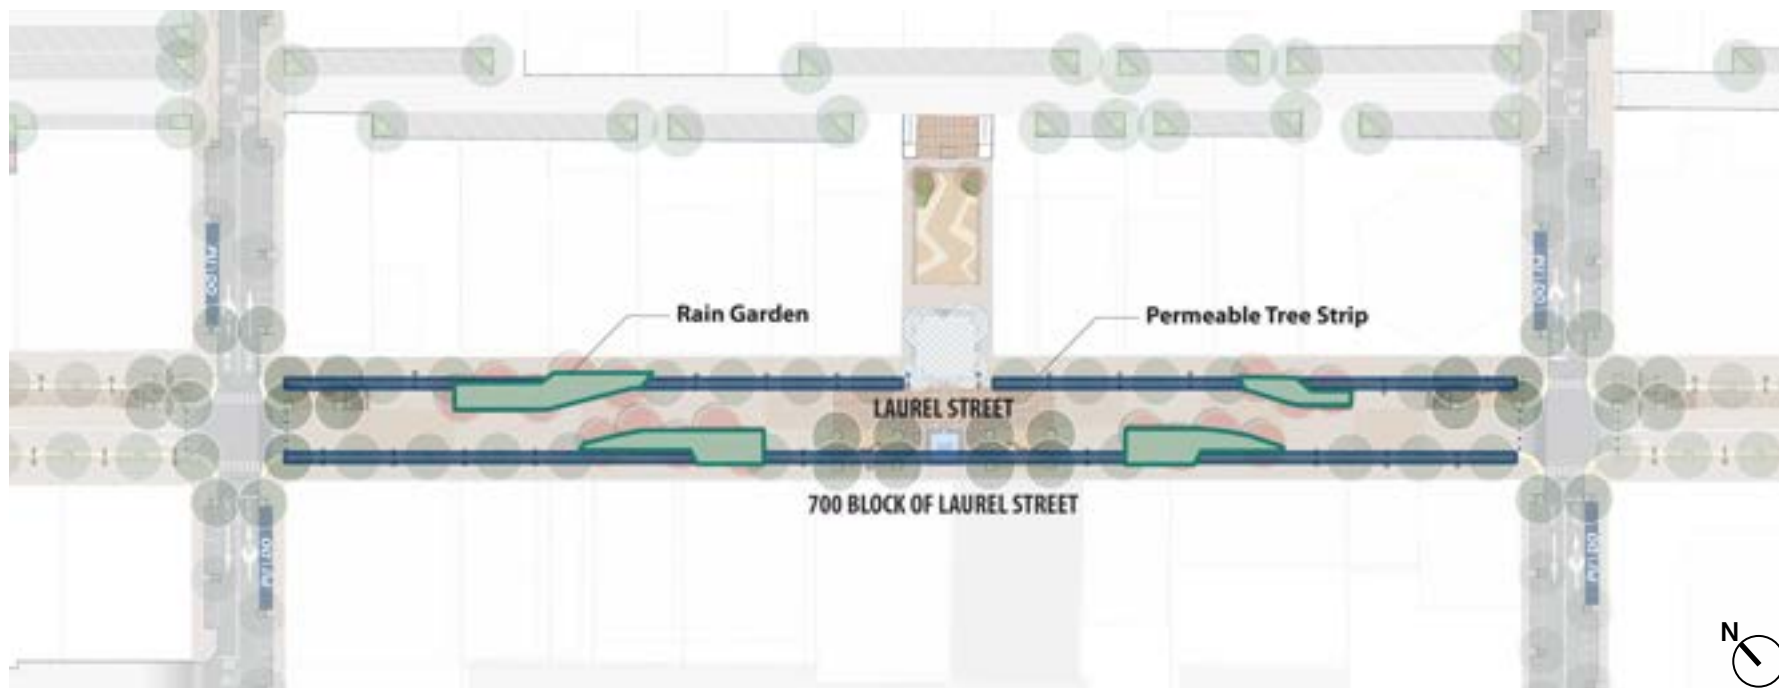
Raingardens and Permeable Tree Strips Along 700 Block of Laurel Street
